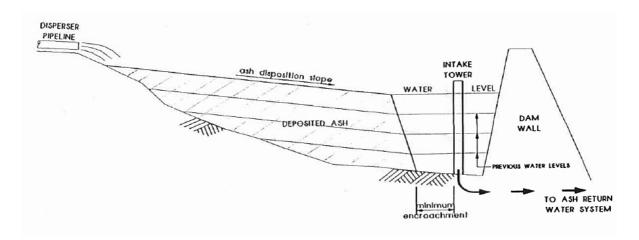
Typical ash dam cross section (Source (AECOM, 2017a)
